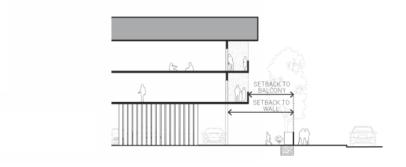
5 -front boundary setback to balcony and wall
